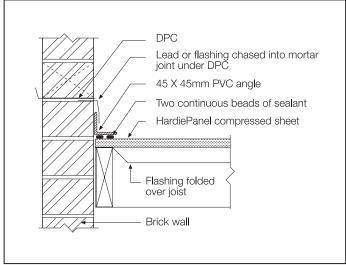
WATER RESISTANT DECK - WALL FLASHING MASONRY DETAIL
